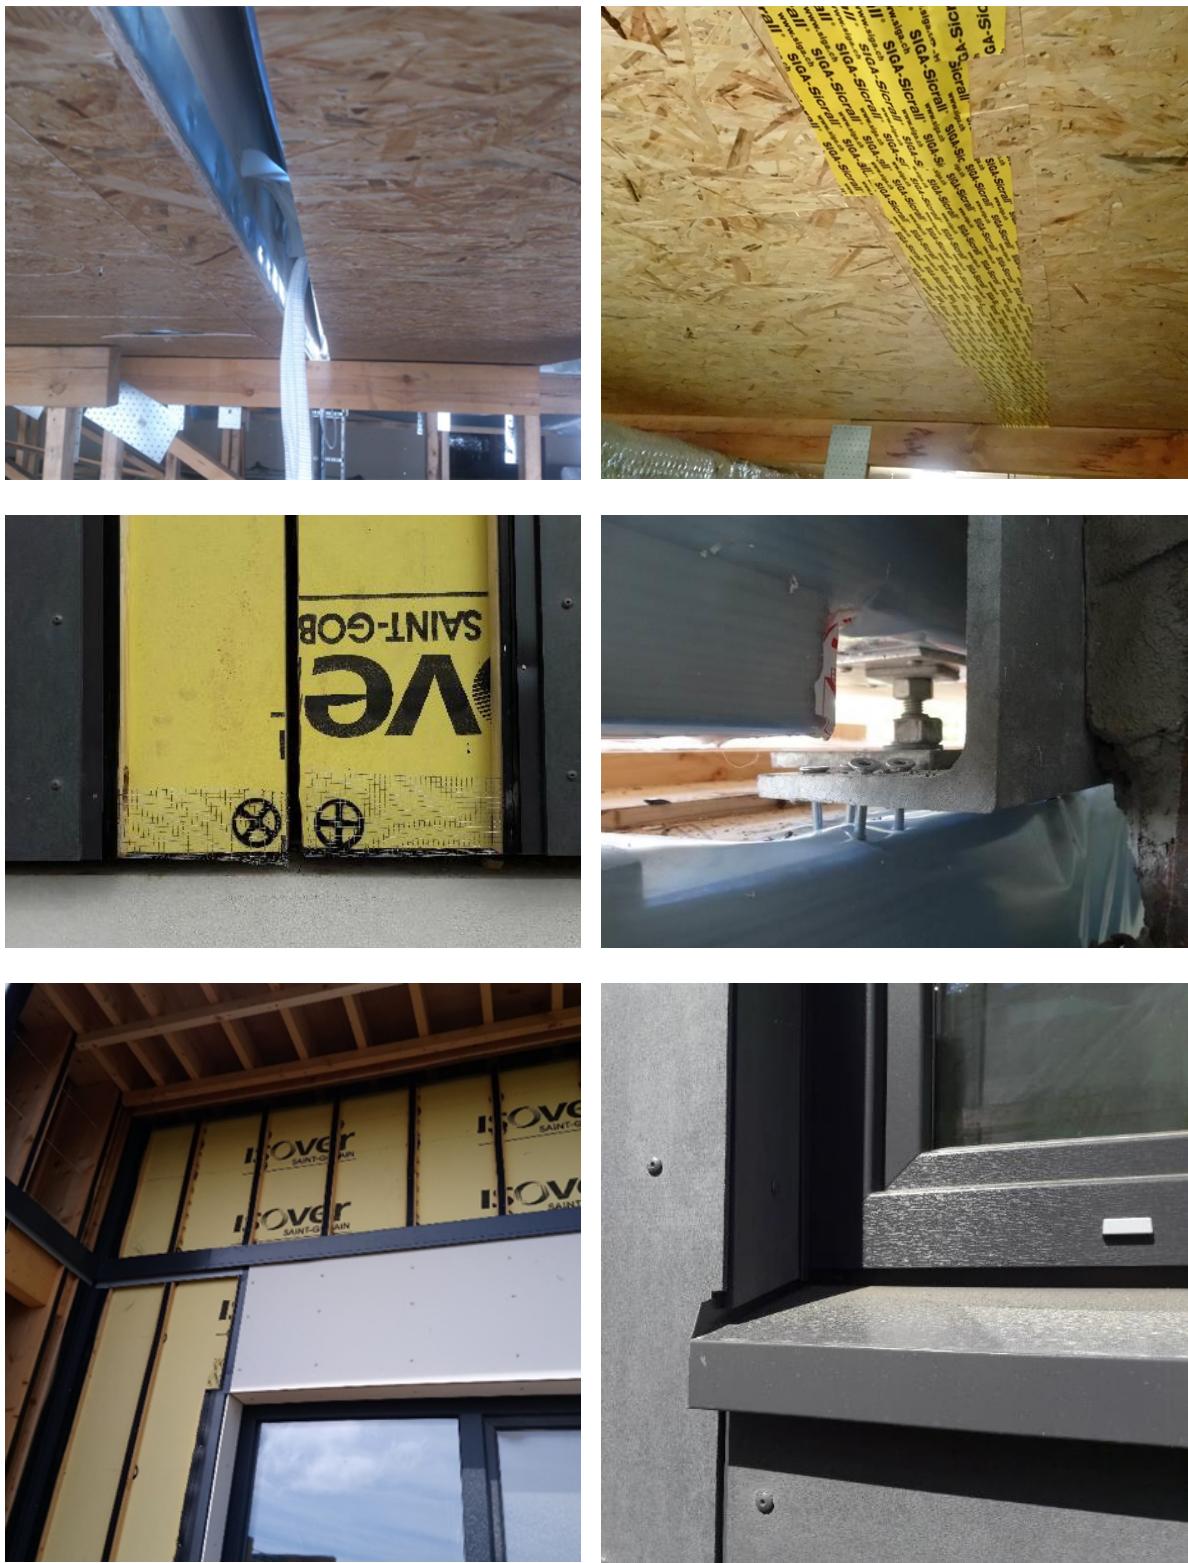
Some examples of challenging points at the pilot building site (spring-autumn 2017)
